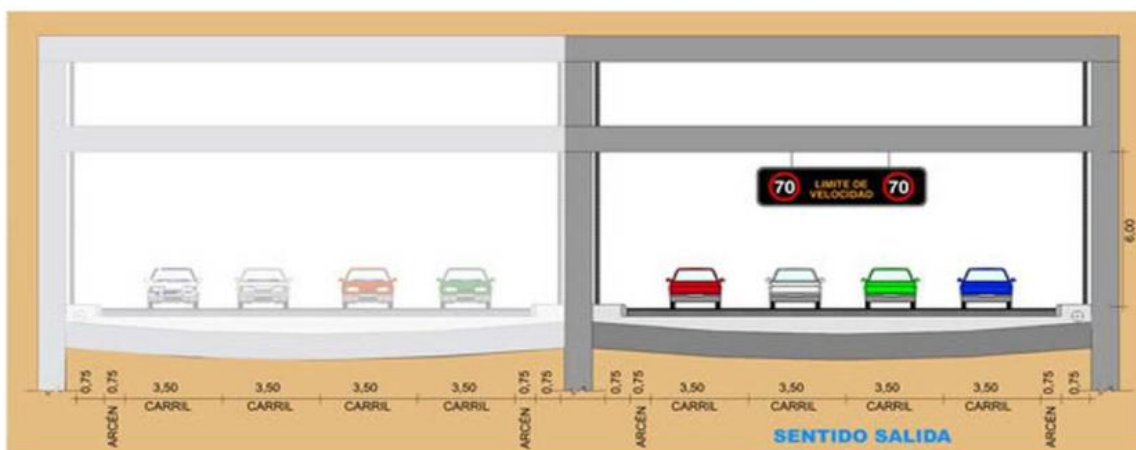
Avenida de Portugal tunnel. Cross section under the Green area, with 4 lanes.
